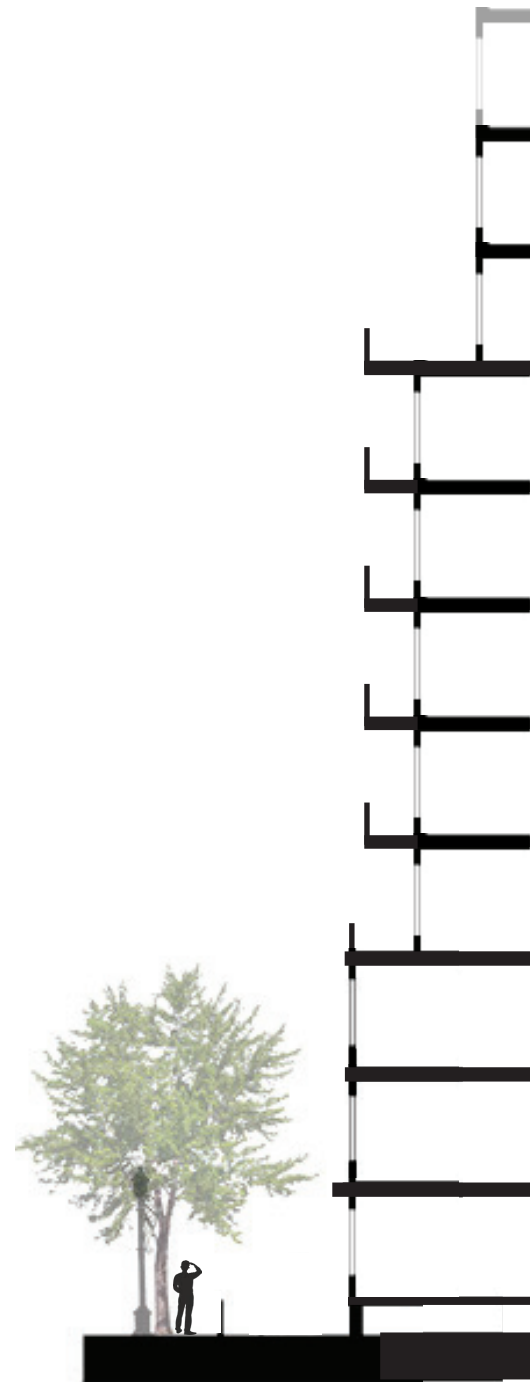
Section view illustrating how taller a building can have a human-scale along a street or public space with a low-rise base and a step back on the middle wall.
